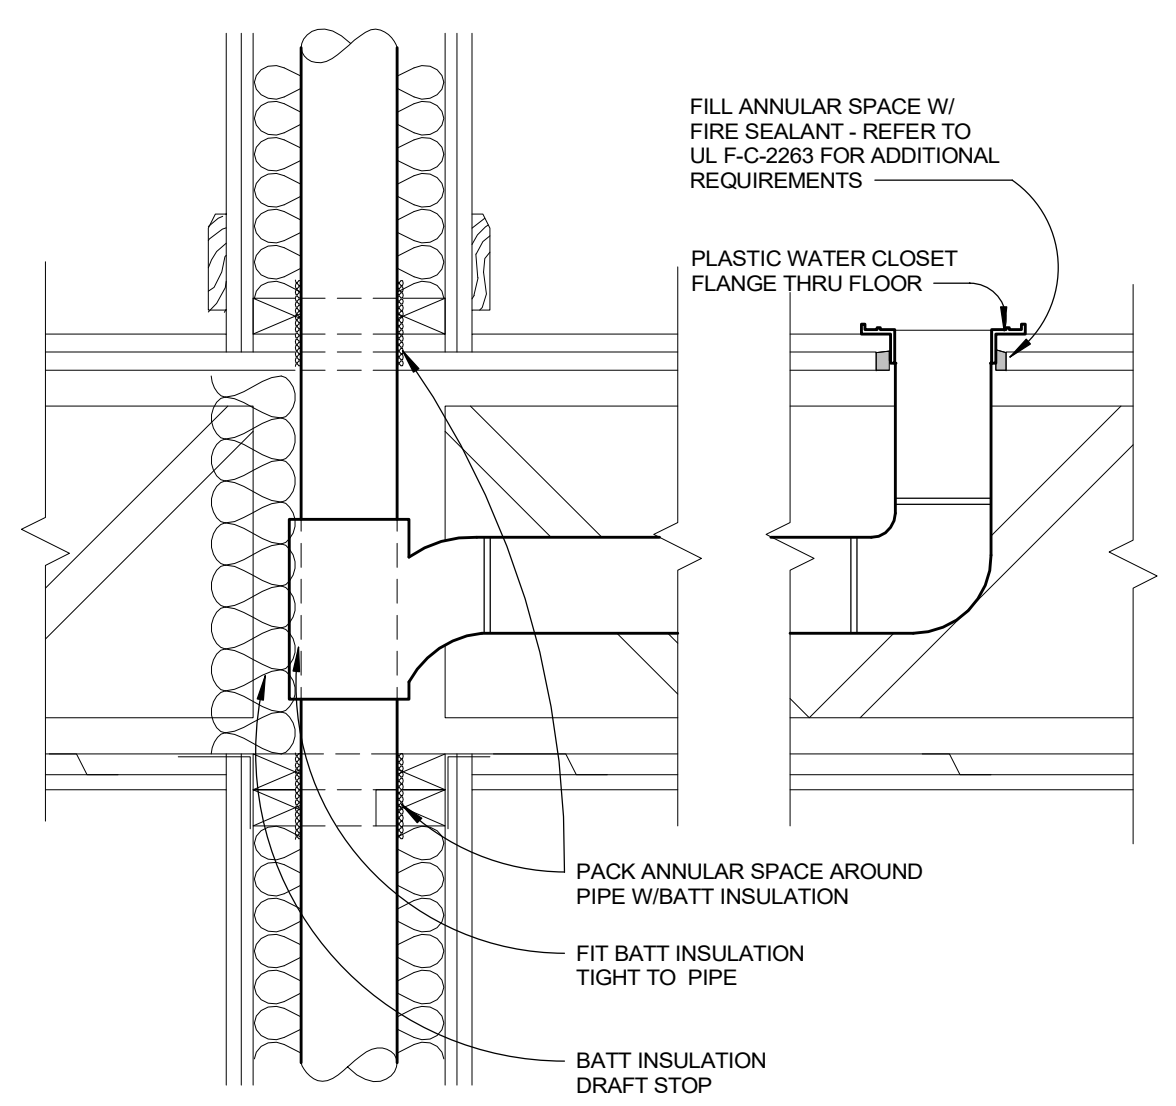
DETAIL @ NON-METALLIC PIPE PENETRATIONS
